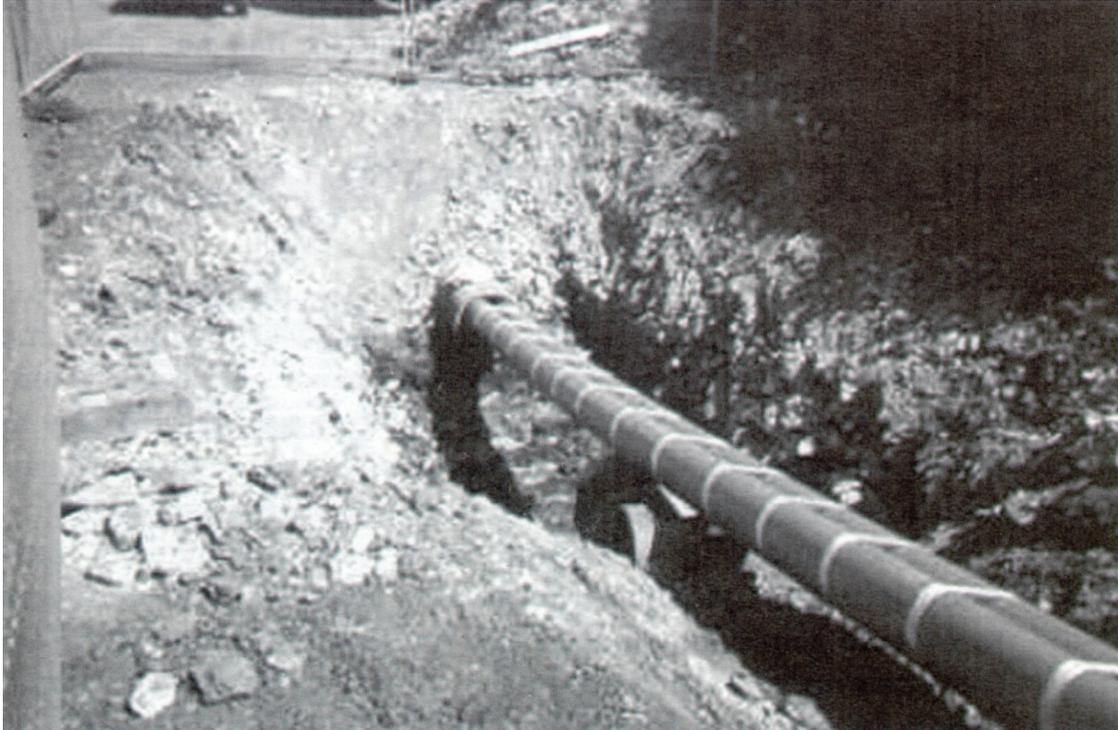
Photo. Installation of Cold-folded and Banded Liner.⁽⁸⁾
